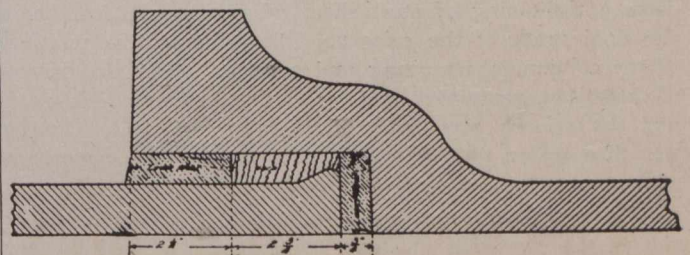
Section Hub and Spigot 48-Inch Harlem River Main, Showing Inside and Outside Joint.
